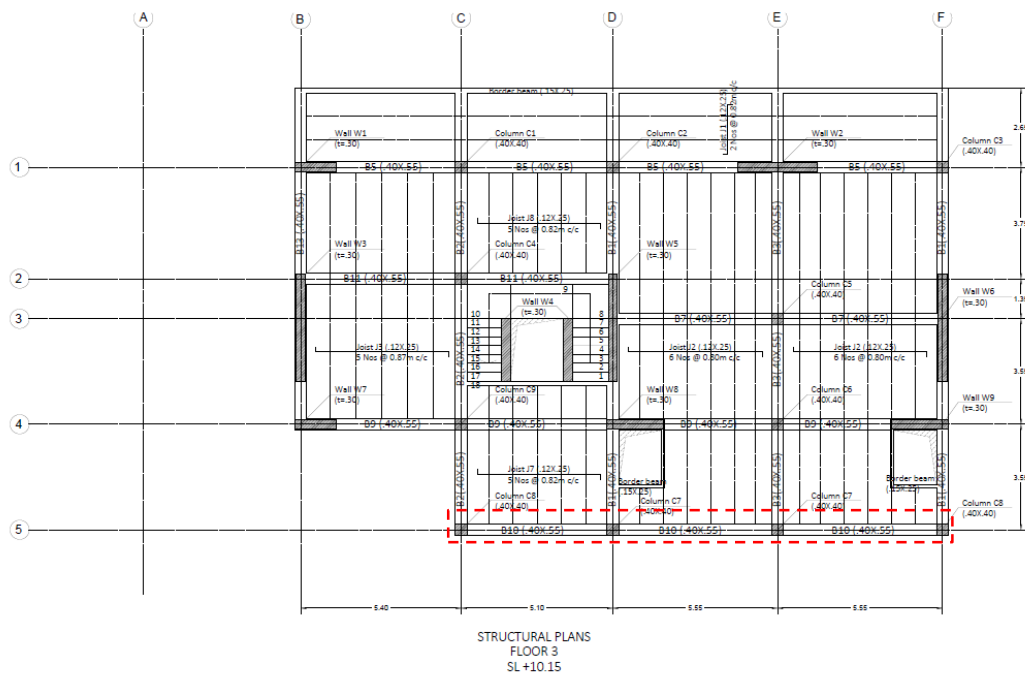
Localization of the beam B-10 in the structural plan of third floor.
